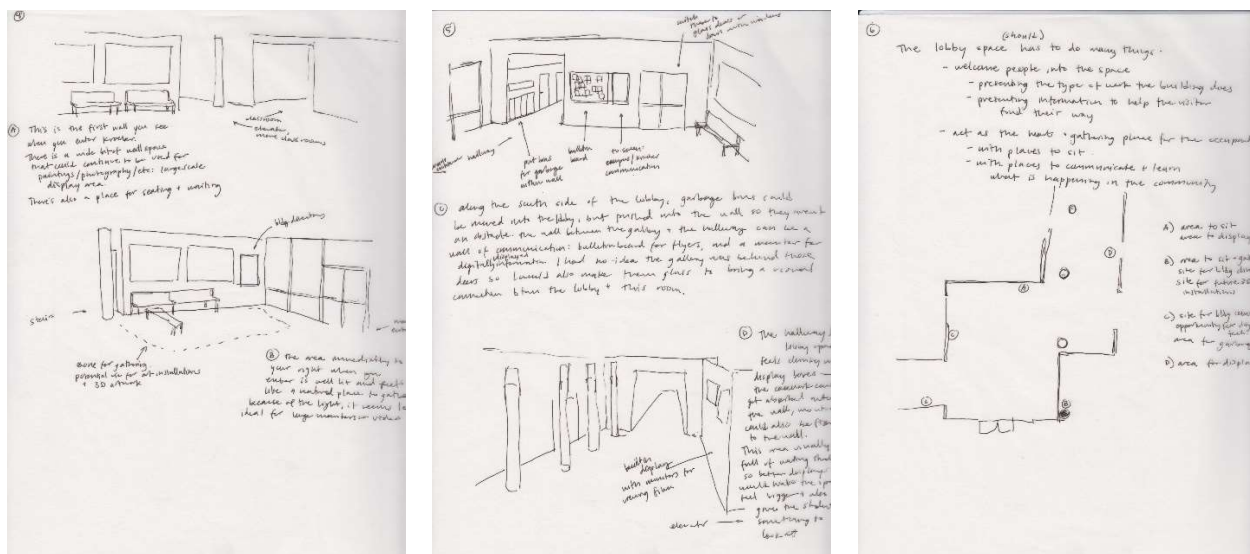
Perspective studies for the design development (left, center). Key plan summarizing proposals in developed in perspective by locating them on the plan (right)
